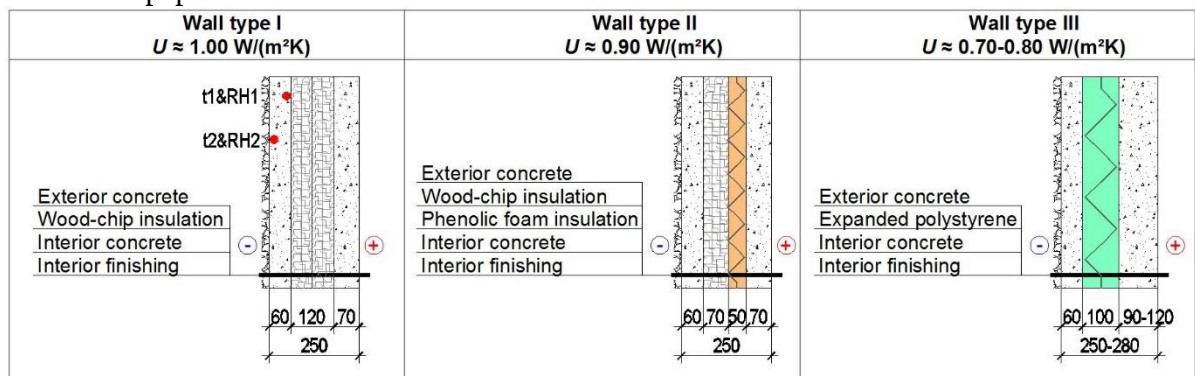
Overview of the typified multi-storey prefabricated concrete large panel elements.
